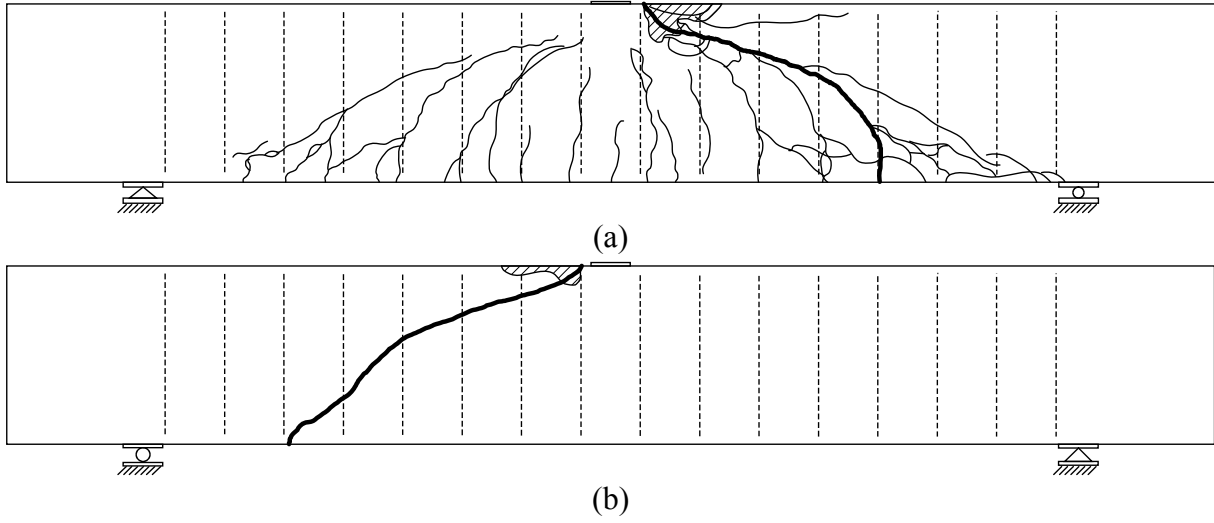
Observed damage in specimen P1S10, (a) front side, (b) back side
